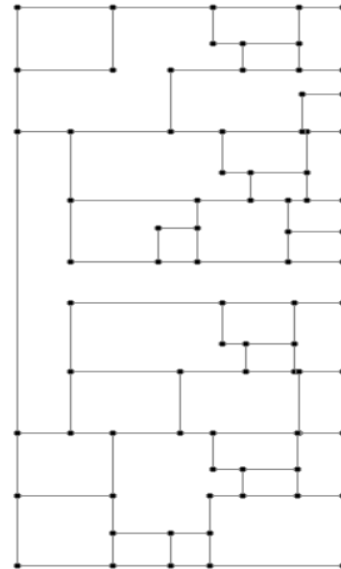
showing Typical plan of G+11 building (RCC) in Staad Pro
